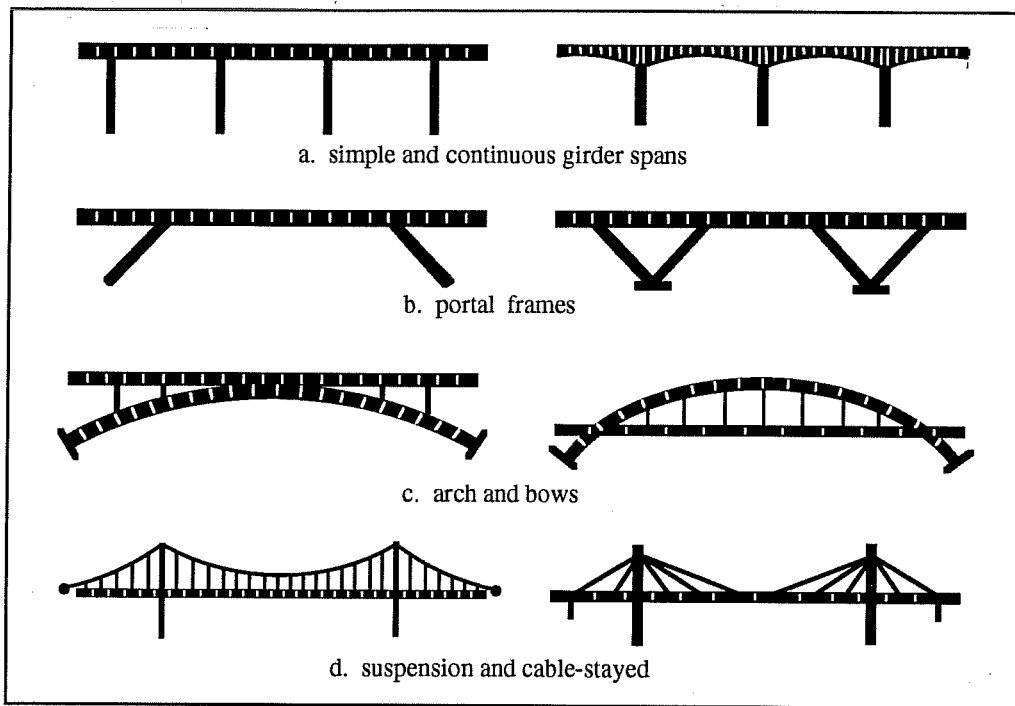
Bridge systems built by combination of concrete segments and longitudinal tendons.
